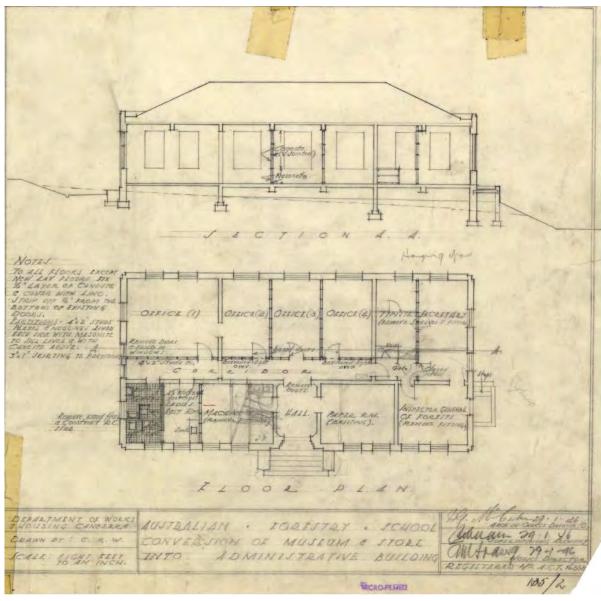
Conversion of Museum and Store in Admin Building plan 1946 (NAA #7689906)
